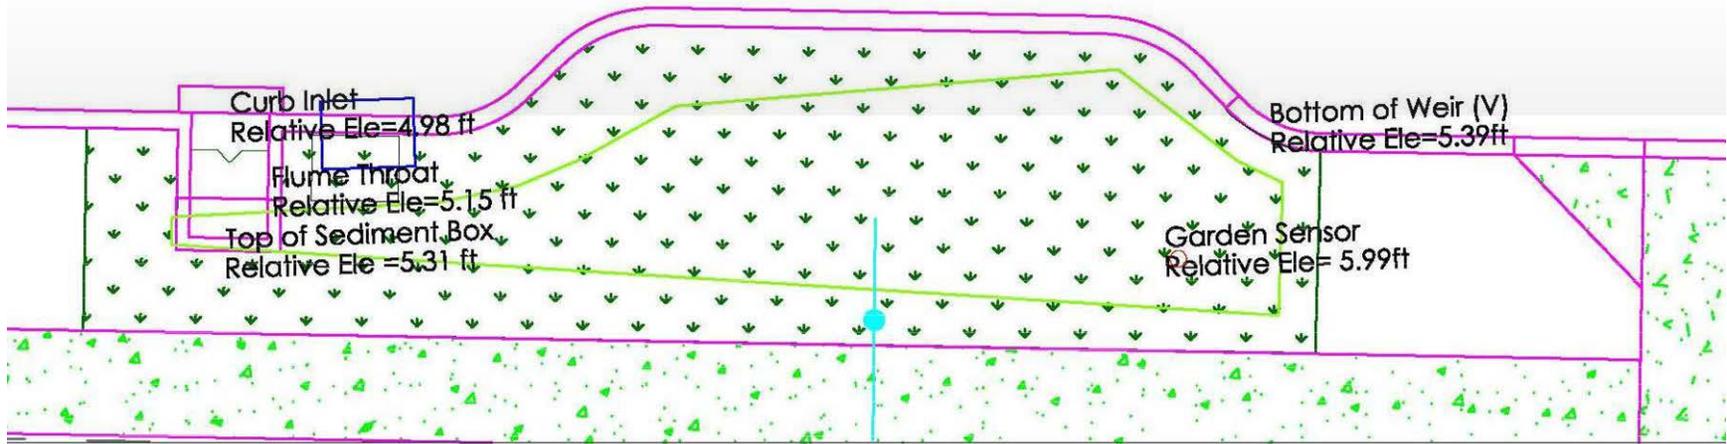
As-built Schematic of Monitoring Installation at Individual GI Solution #2 at 1325 East 76th Street (Curb Extension)
